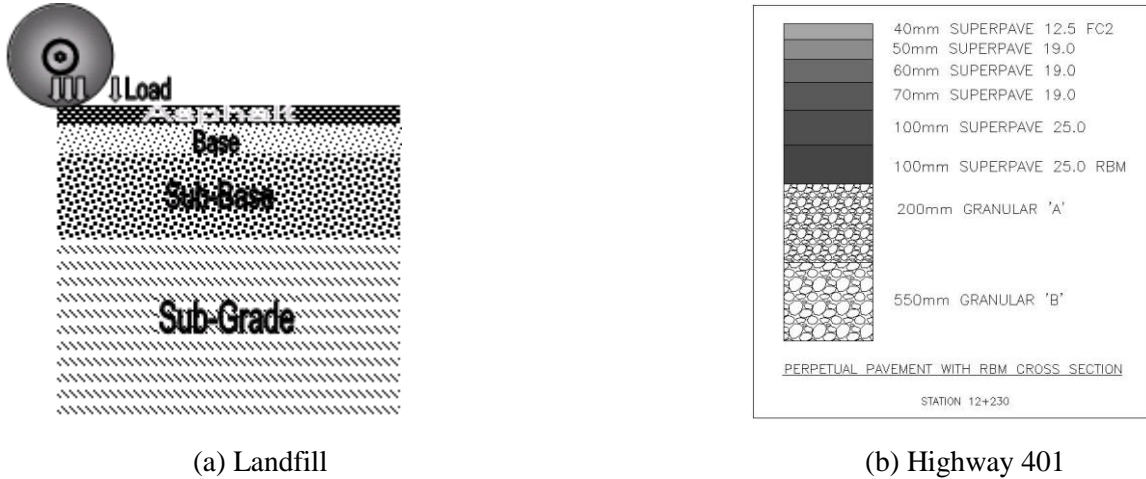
Pavement layers at the CPATT sites, (a) Landfill, (b) Highway 401, section 12+230
